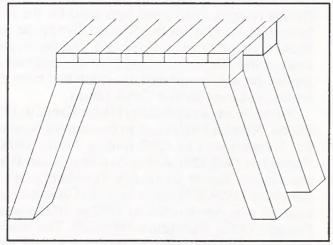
Schematic sketch showing the construction of the Cape Horn tunnel, Miocene Ditch.
